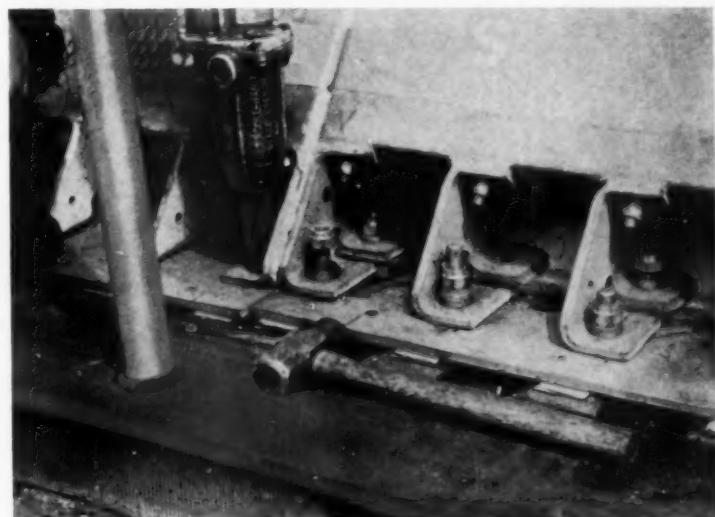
Base ring panels were fastened to building as shown. Over 1200 bolts hold the radome down and distribute the load to the building structure and the basic foundation.
